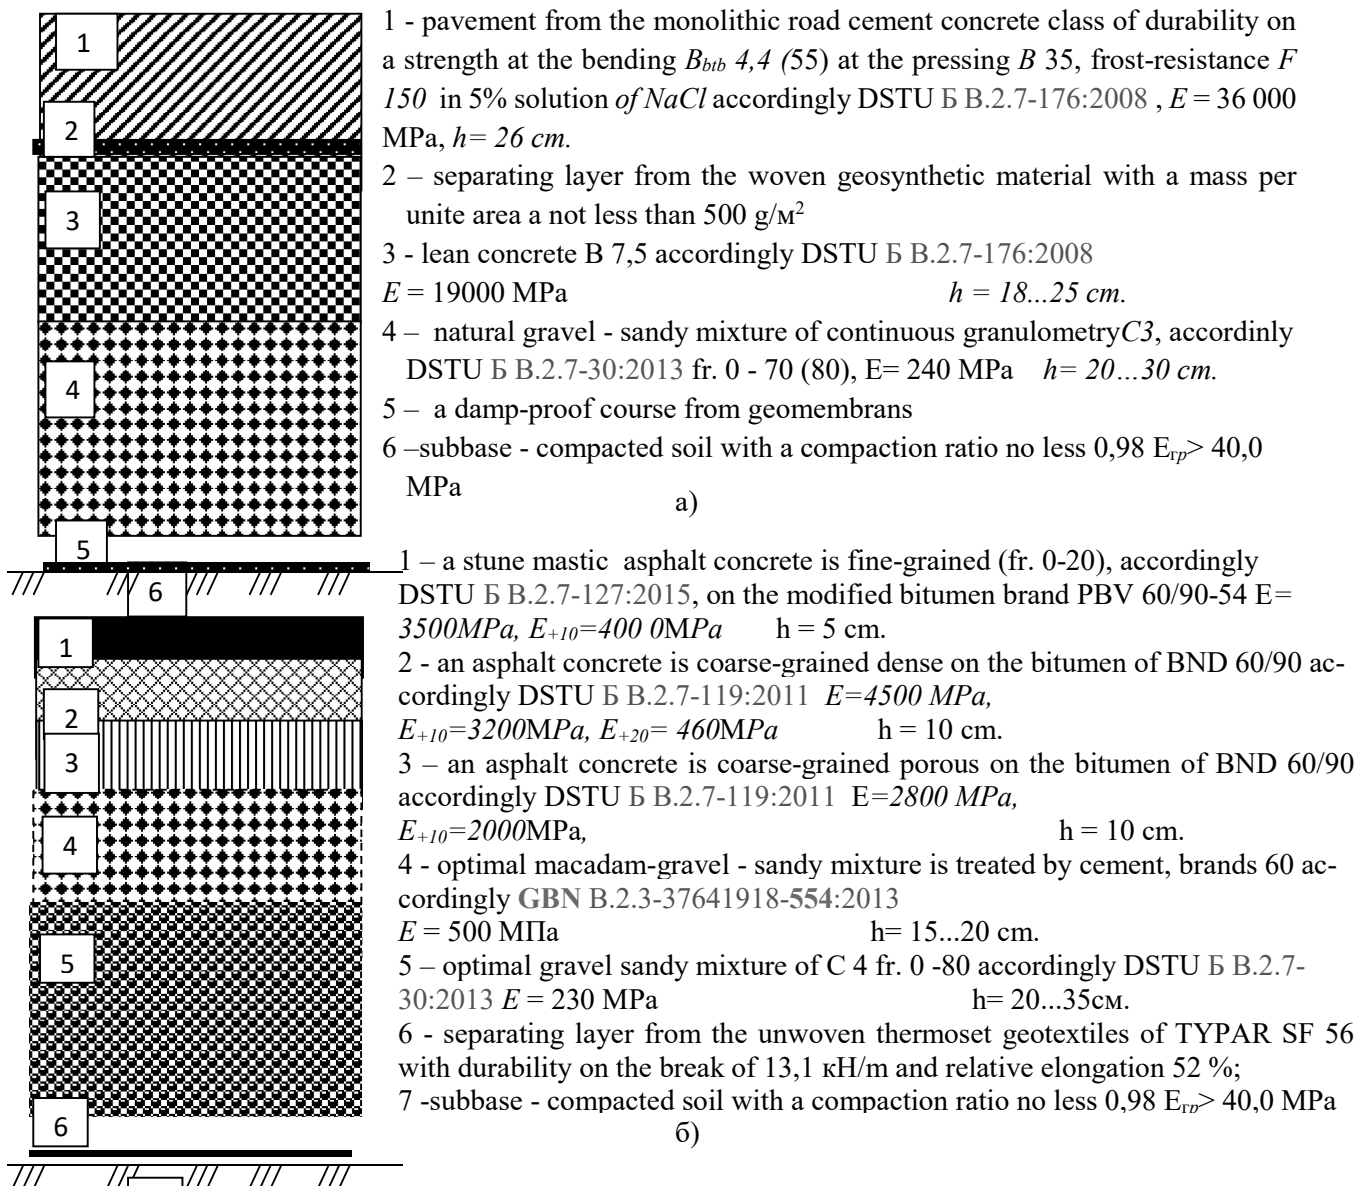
Recommended construction of rigid (a) and flexible (б) road pavement
